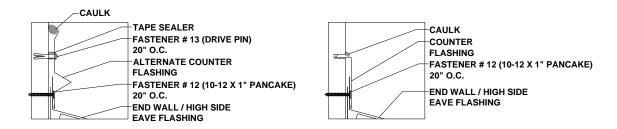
Floating Endwall/Parapet High Side Eave Detail
